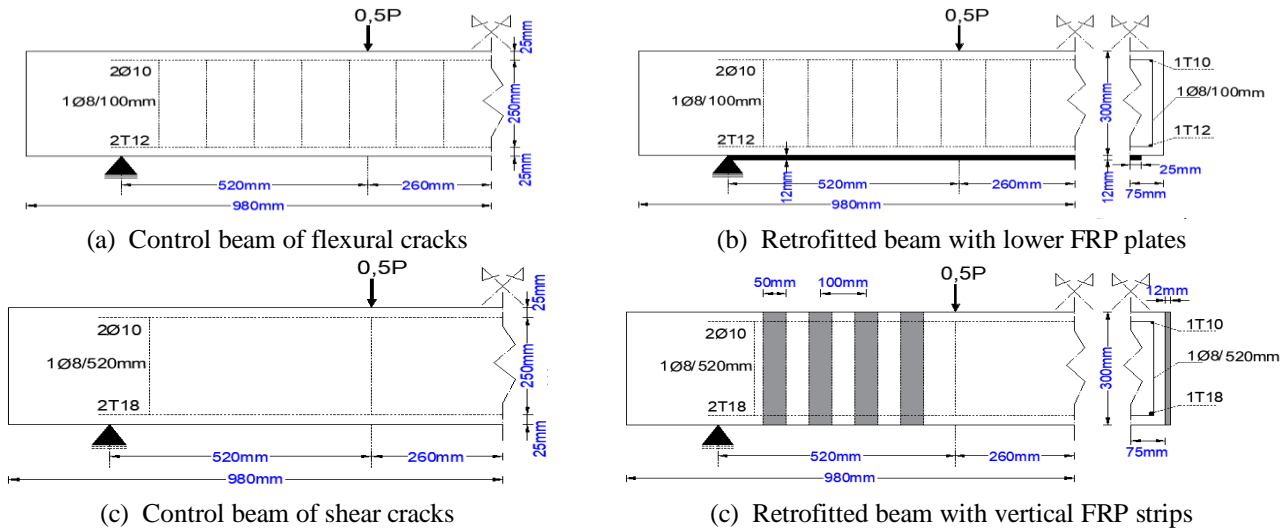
Geometry, arrangement of reinforcement and load by quarter scale of tested beams
